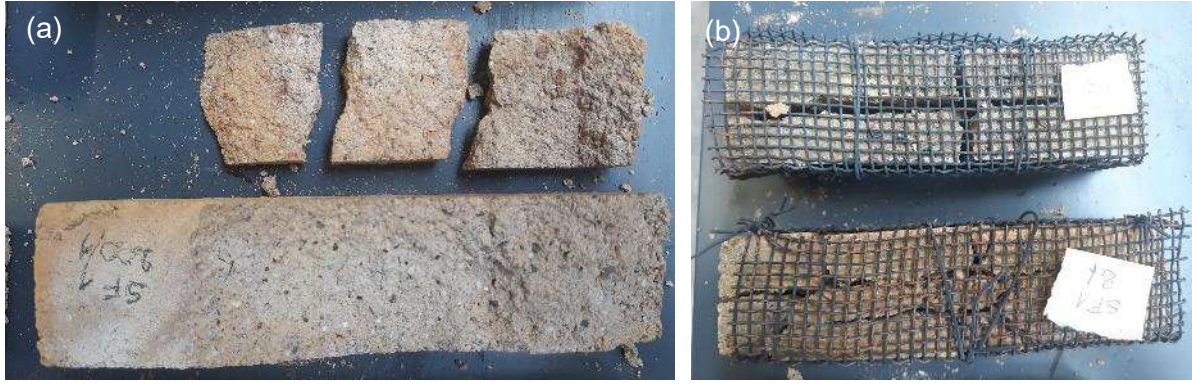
Full exposure of samples to the heat (a) surface spalling; (b) full disintegration due to thermal load.
